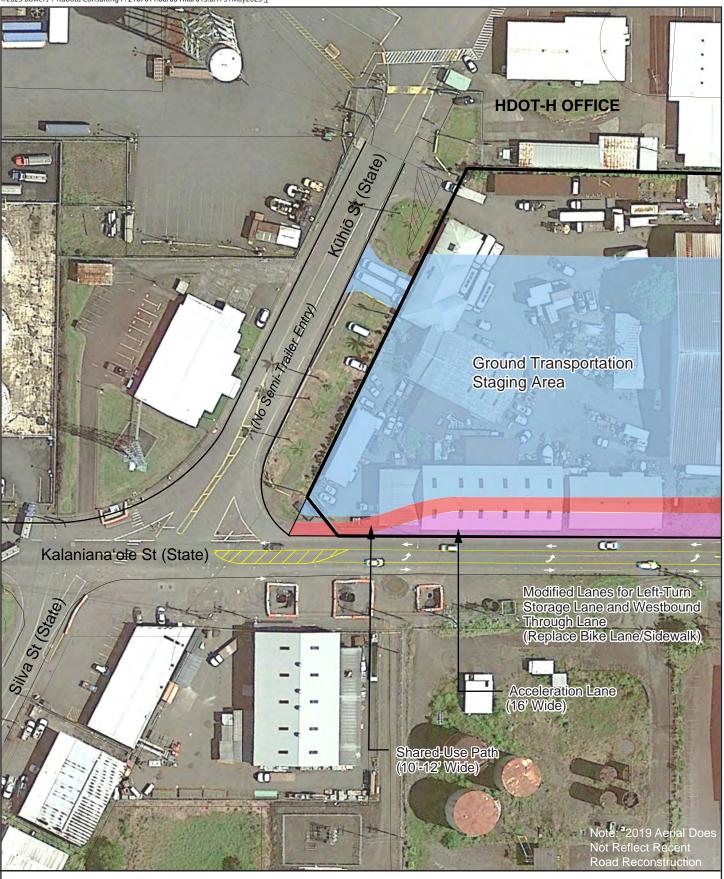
CONCEPTUAL SITE PLAN OF KUHIO STREET IMPROVEMENTS
